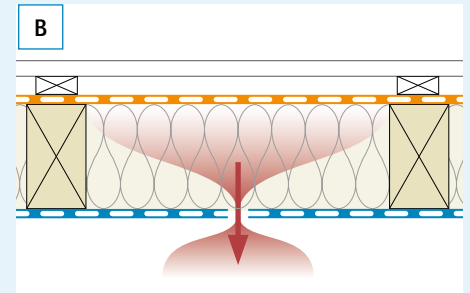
B: Overheating up due to air flow: non-airtight roof construction
